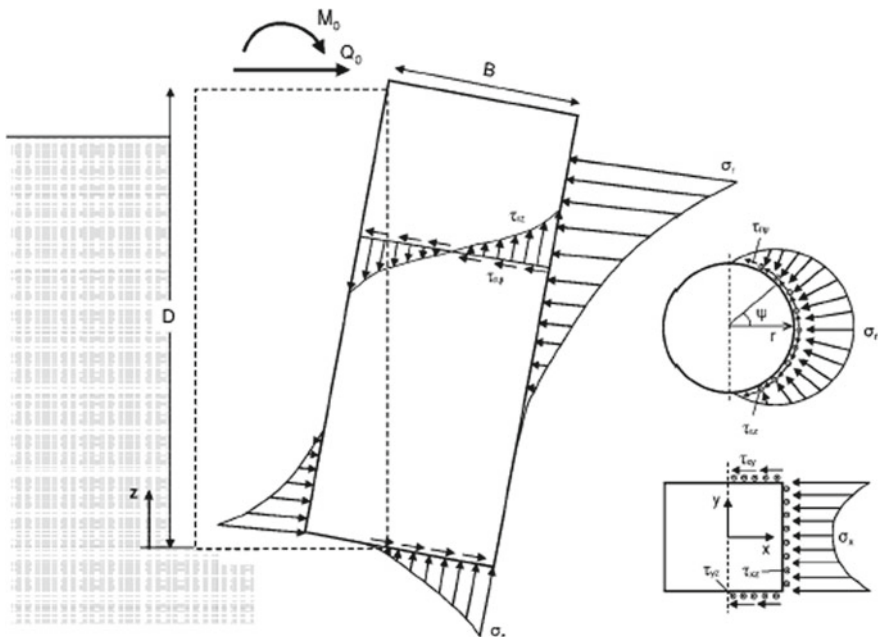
Stresses at caisson-soil interface for circular and square plan shape [4]
